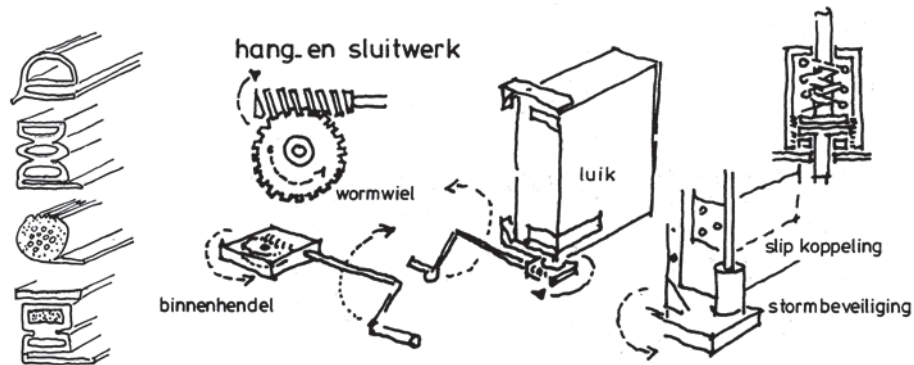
Examples of sealing rubber gaskets for insulating shutters (left) and the original sketches of worm wheel for operating shutters (right)
